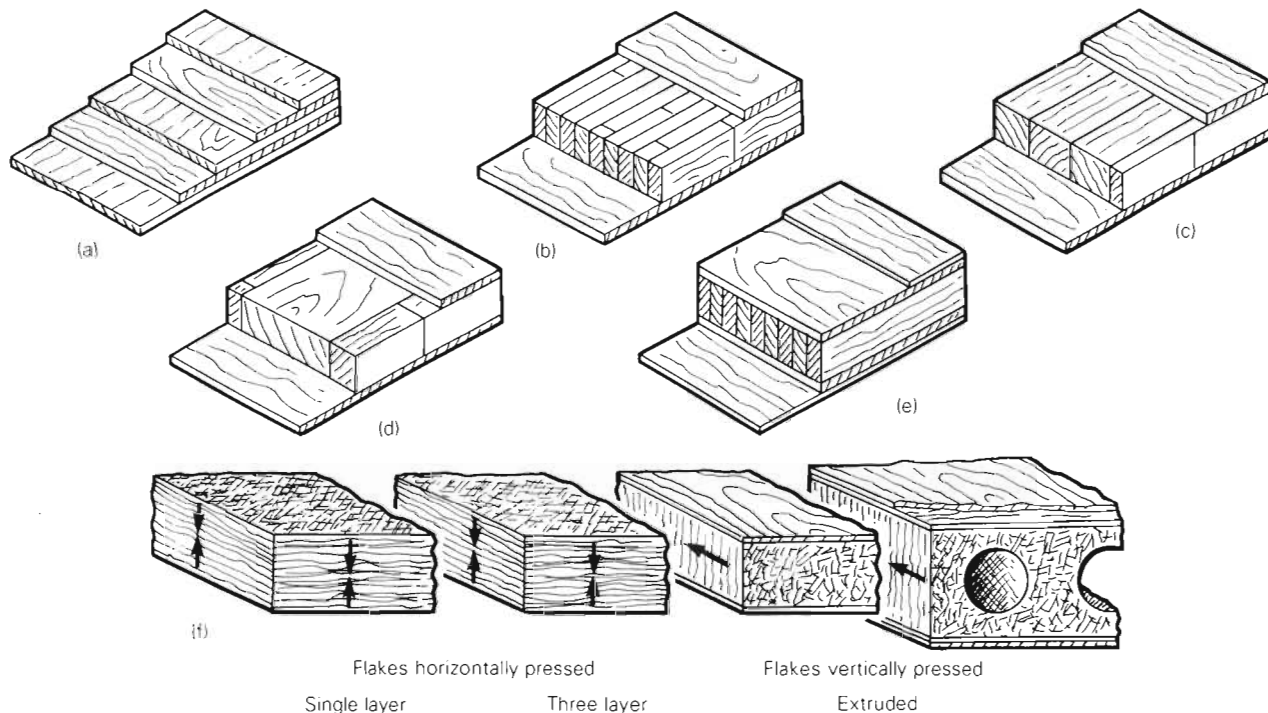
Manufactured boards: (a) multiply, (b) laminboard, (c) blockboard, (d) battenboard, (e) composite, (f) particle boards.
